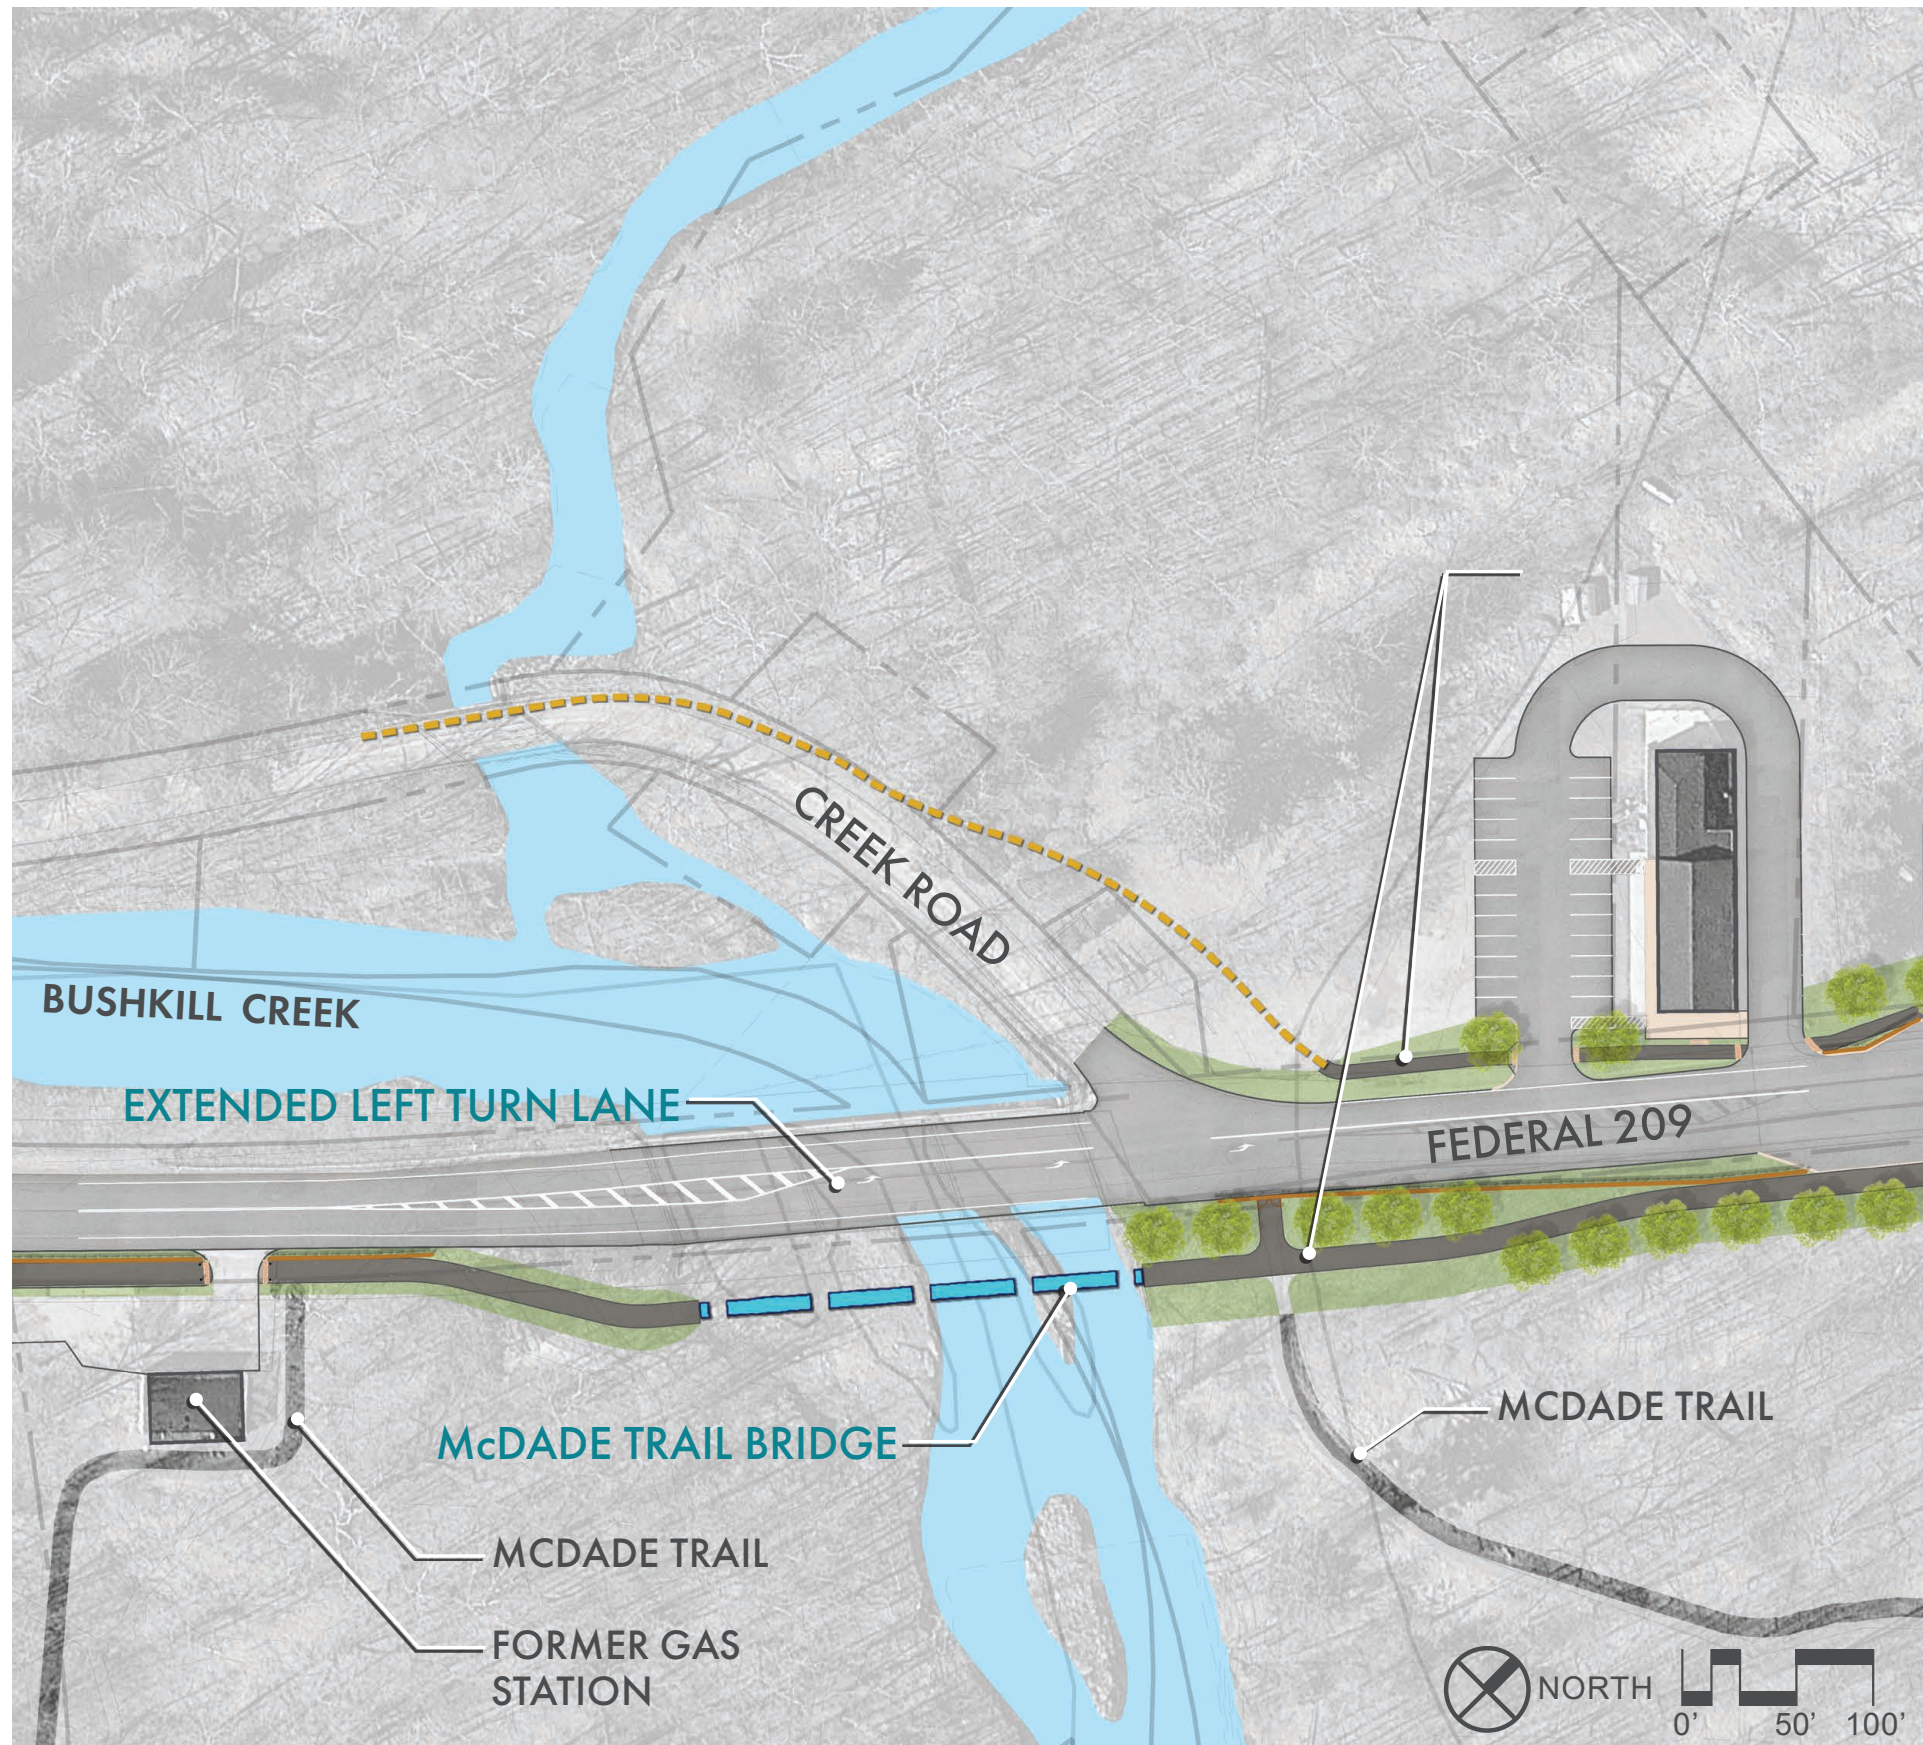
Site Plan for Pedestrian-Bicycle Improvements in Bushkill Village. NOTE: Preliminary engineering for future lane reconfigurations of Federal 209 are shown, but a new geometry for a replacement Federal 209 bridge is not depicted.
